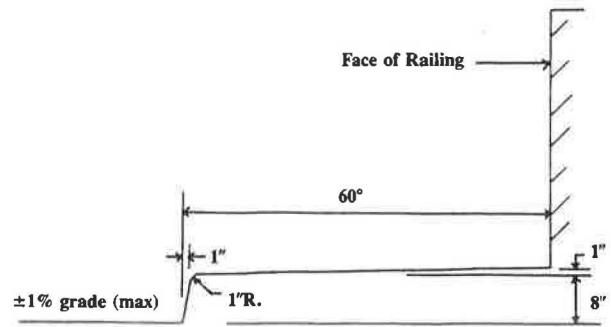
Standard Raised Sidewalk for Use in Combination Railing Testing.
